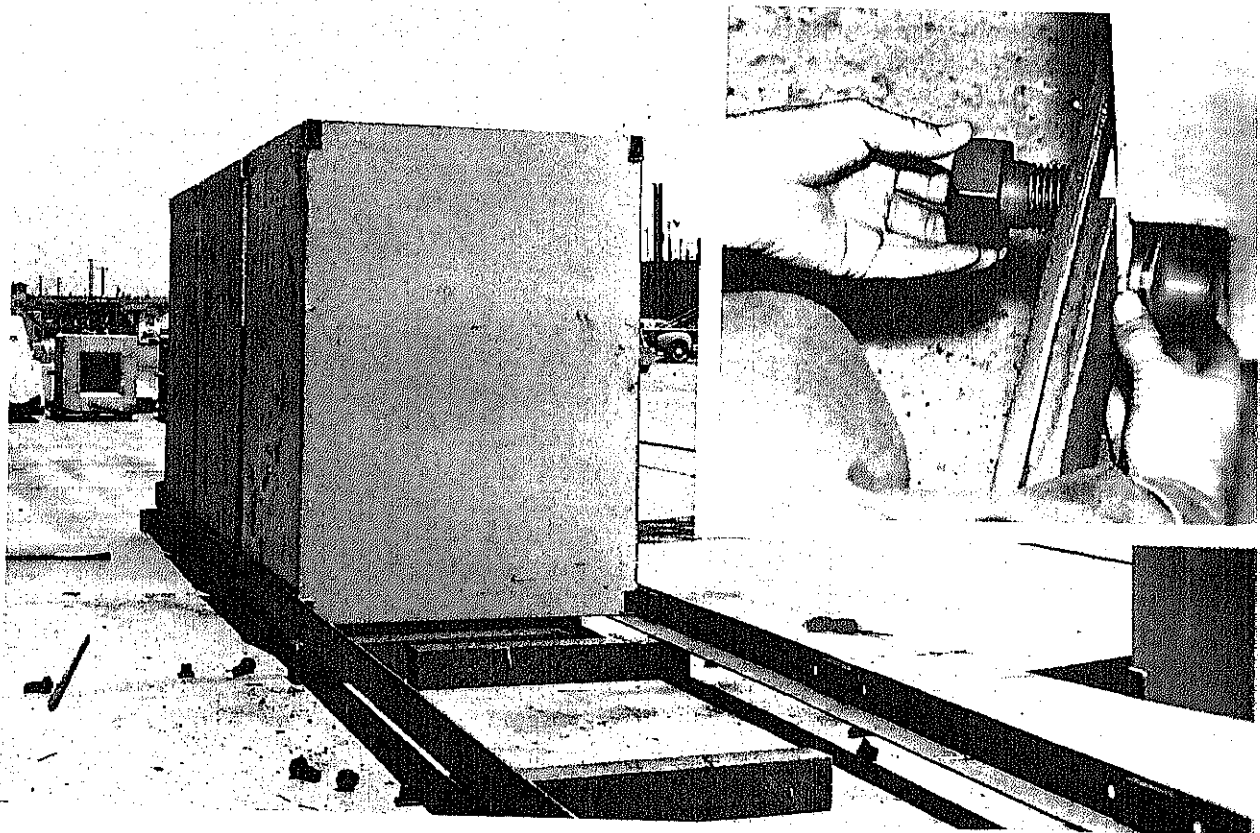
Assembly angles, bolts, and flanged nuts.
